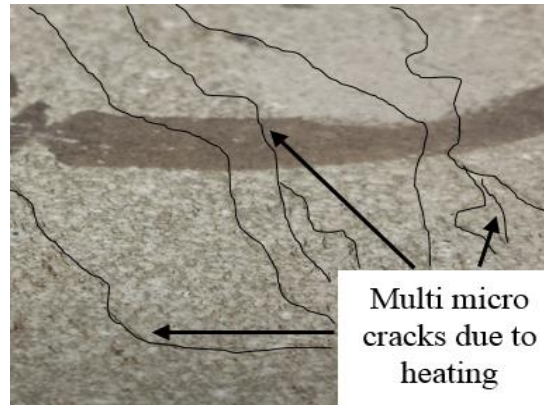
Surface cracking of ECC specimens due to heat treatment.
